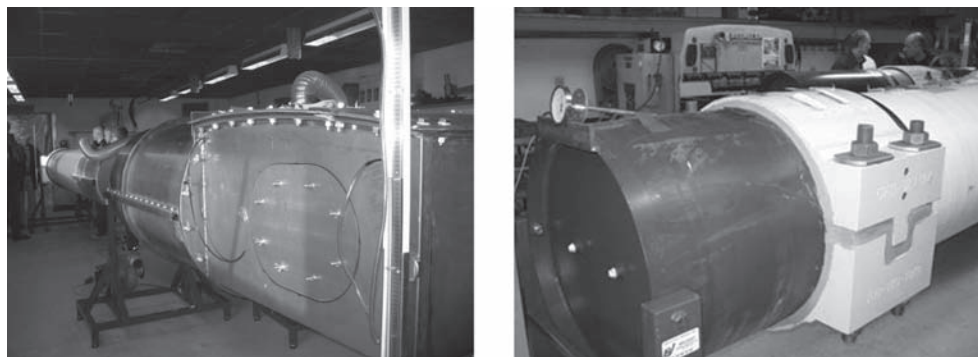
Full scale testing of sealing, left saddle and shroud, right cable band and transition at band.
